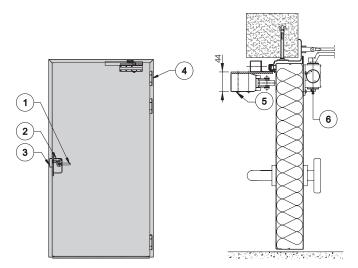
Diagram of a single-leaf door – vertical cross-section including the ventilation system
